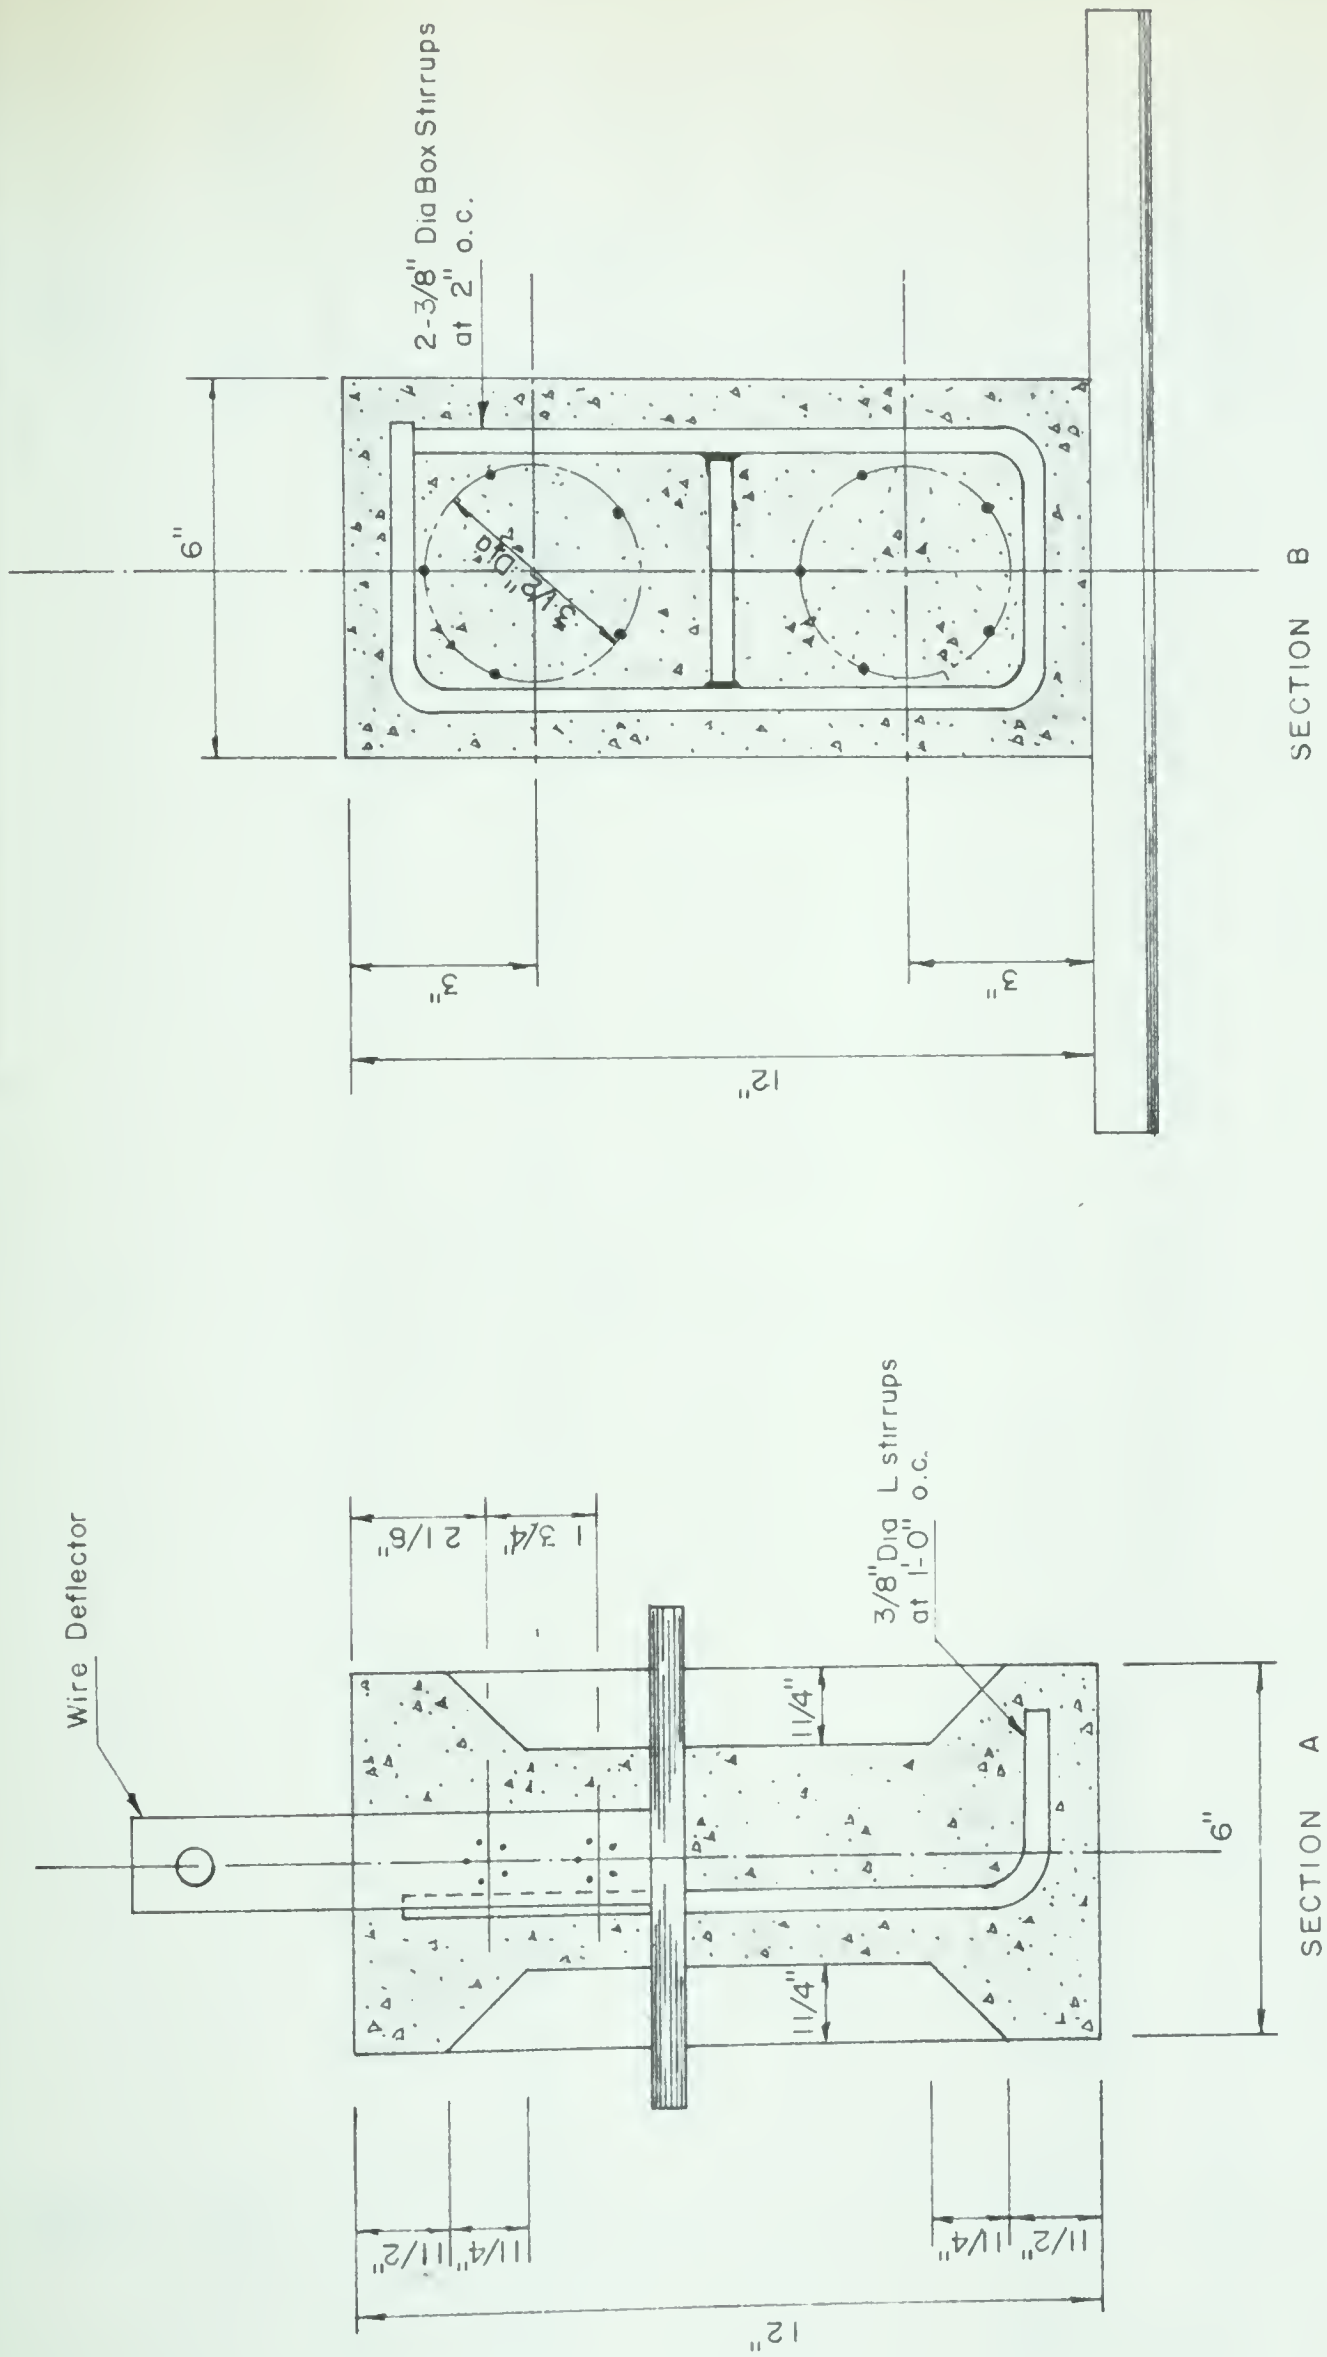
(b) DETAILS OF THE PRETENSIONED BEAMS
